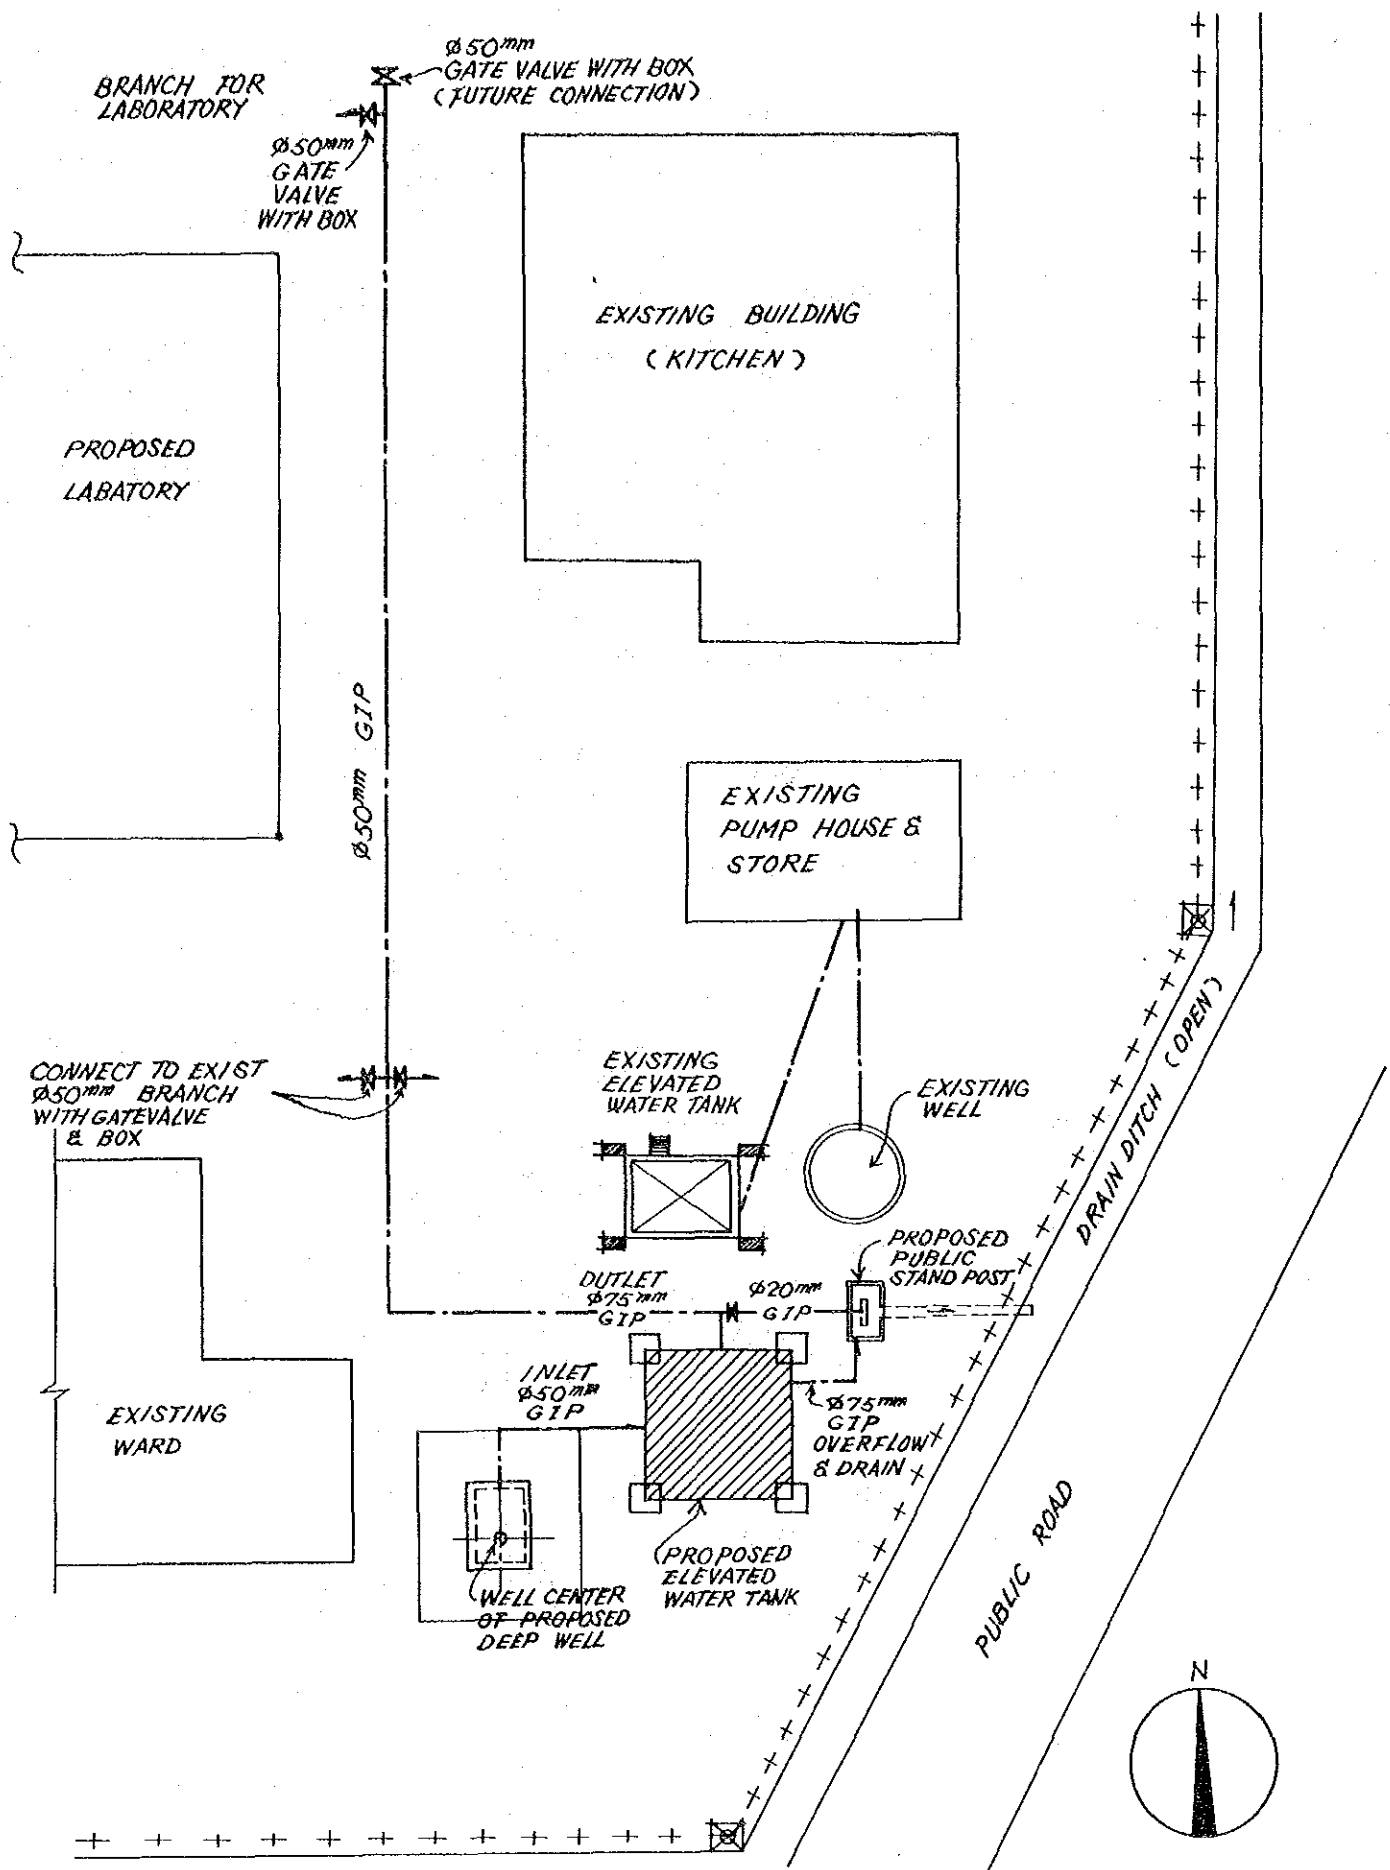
GENERAL PLAN OF WATER SUPPLY FACILITY
